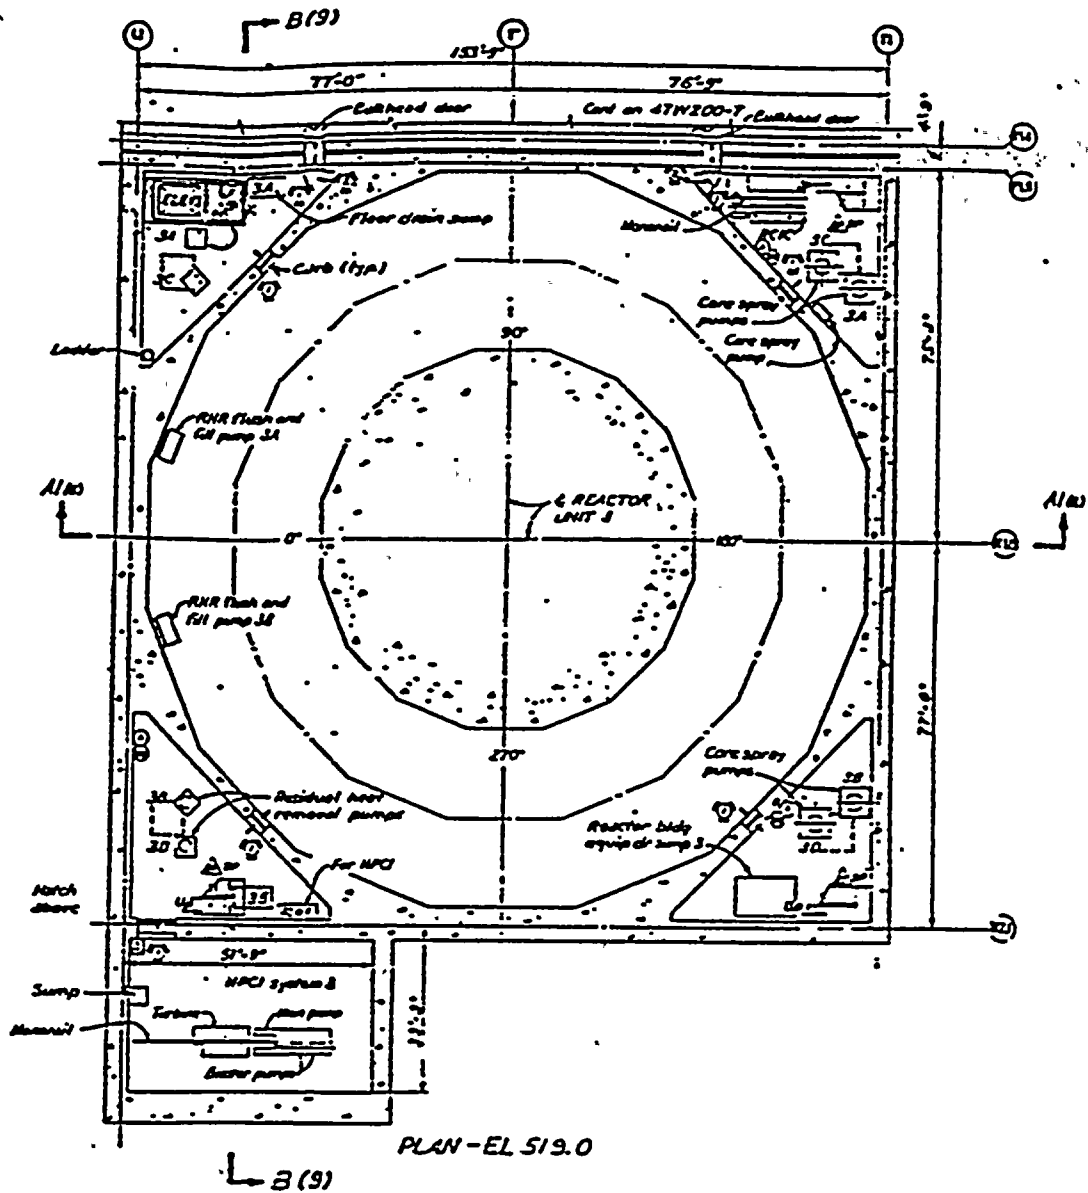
(Page 2 of 2). Reactor Building, Elevation 519'
